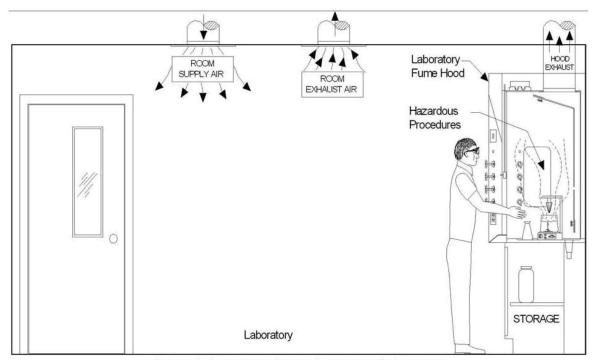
Typical Constant Volume Laboratory Ventilation System
